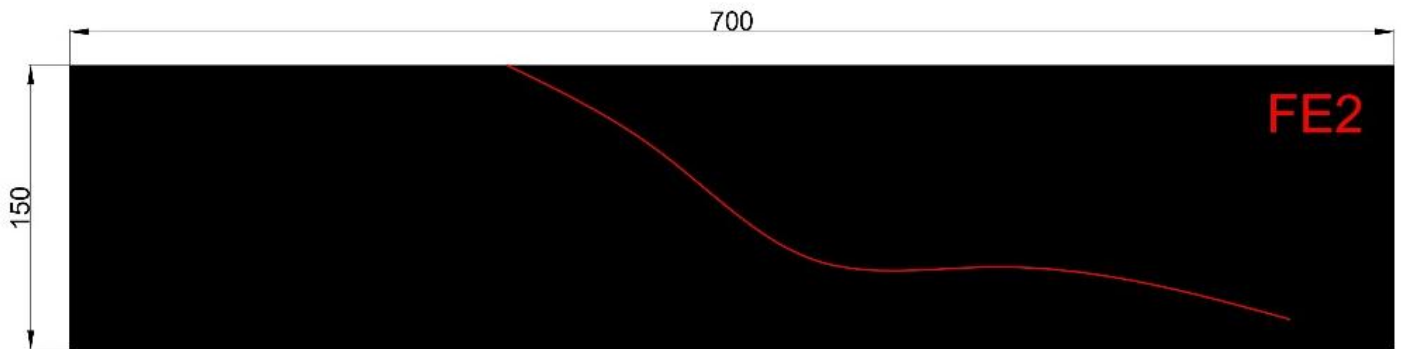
Drawing of crack pattern on longitudinal section for FE- 2
